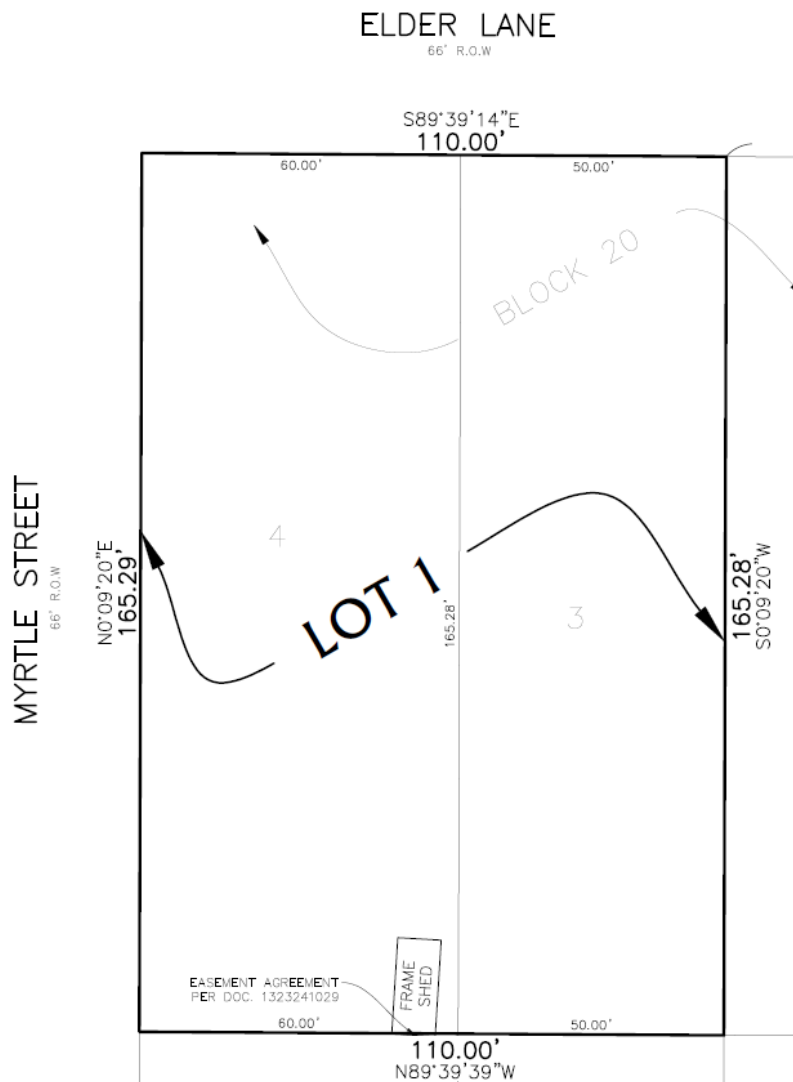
Excerpt of Proposed Junker's Subdivision Plat
